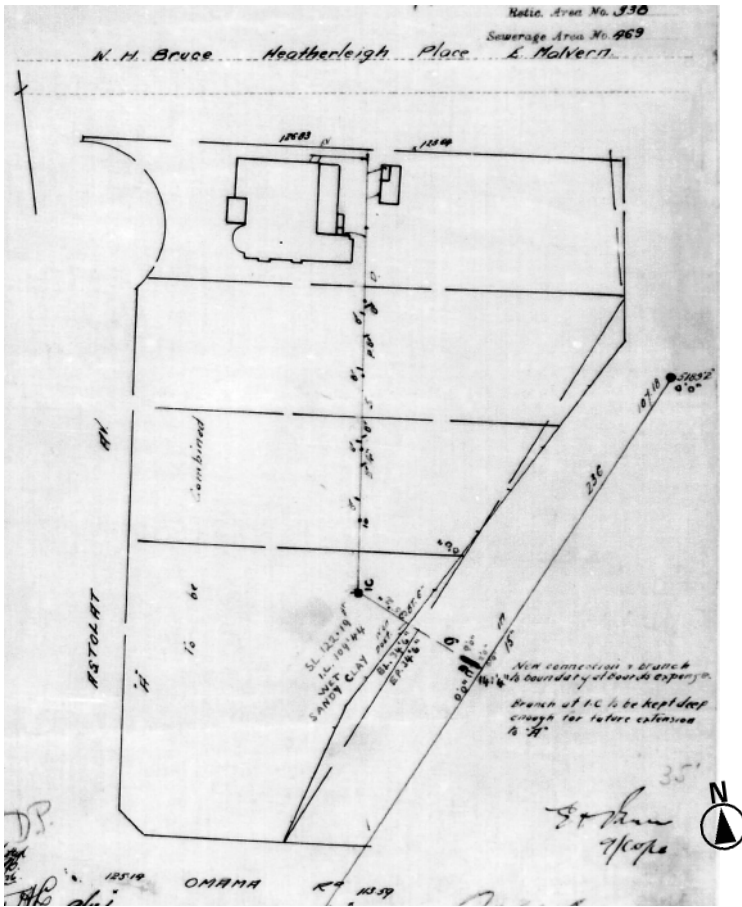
Drainage plan dated July 1926, showing a footprint of the house at 6 Astolat Avenue (Lot 9). W H Bruce is recorded at top (Source: SEW, Drainage Plan No. 154800)
